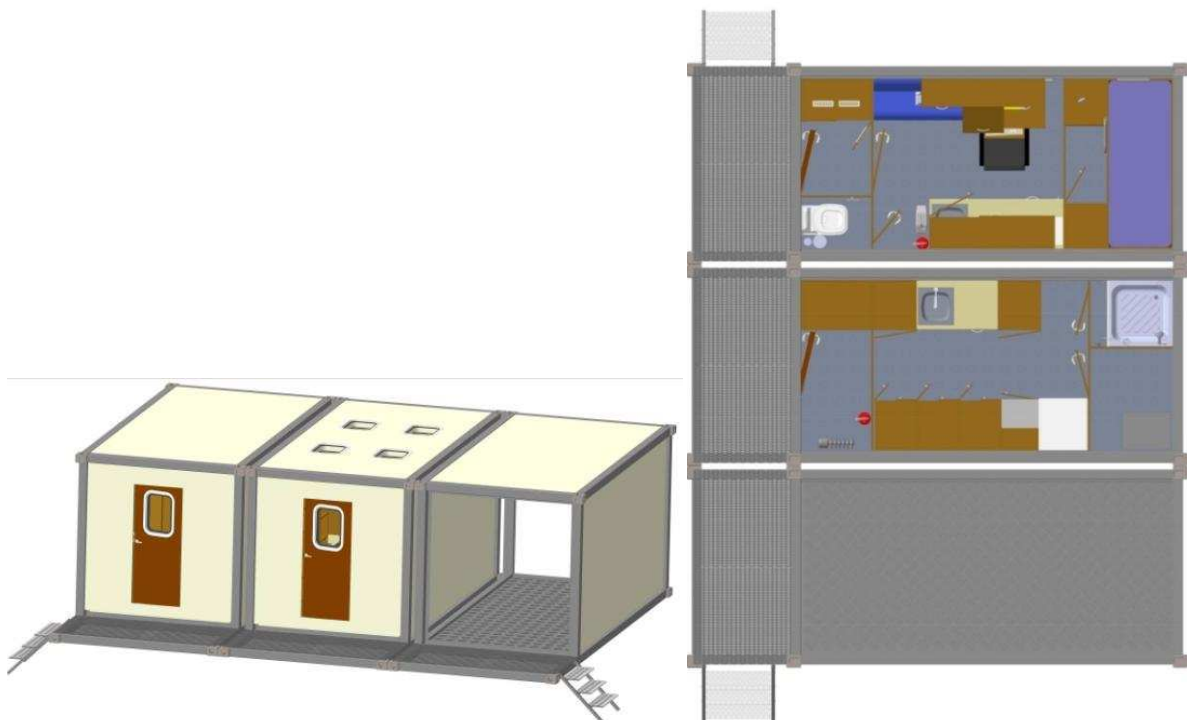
General view (A) and layout (B) of the laboratory & residential single-storey module
